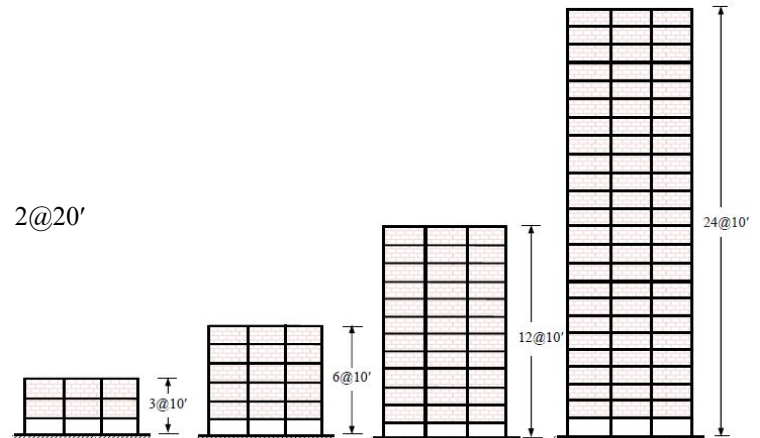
Elevation of the 3-, 6-, 12- and 24-storied buildings (long direction)
